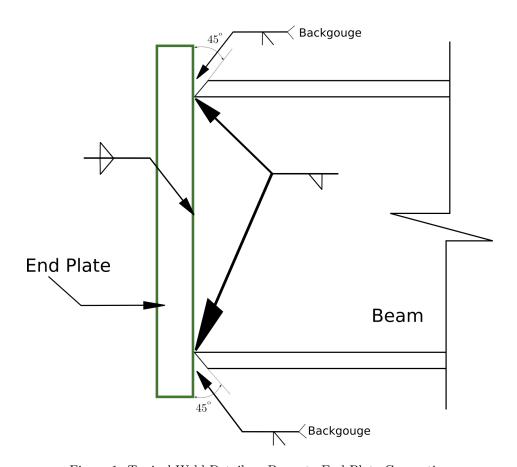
Typical Weld Details -- Beam to End Plate Connection
